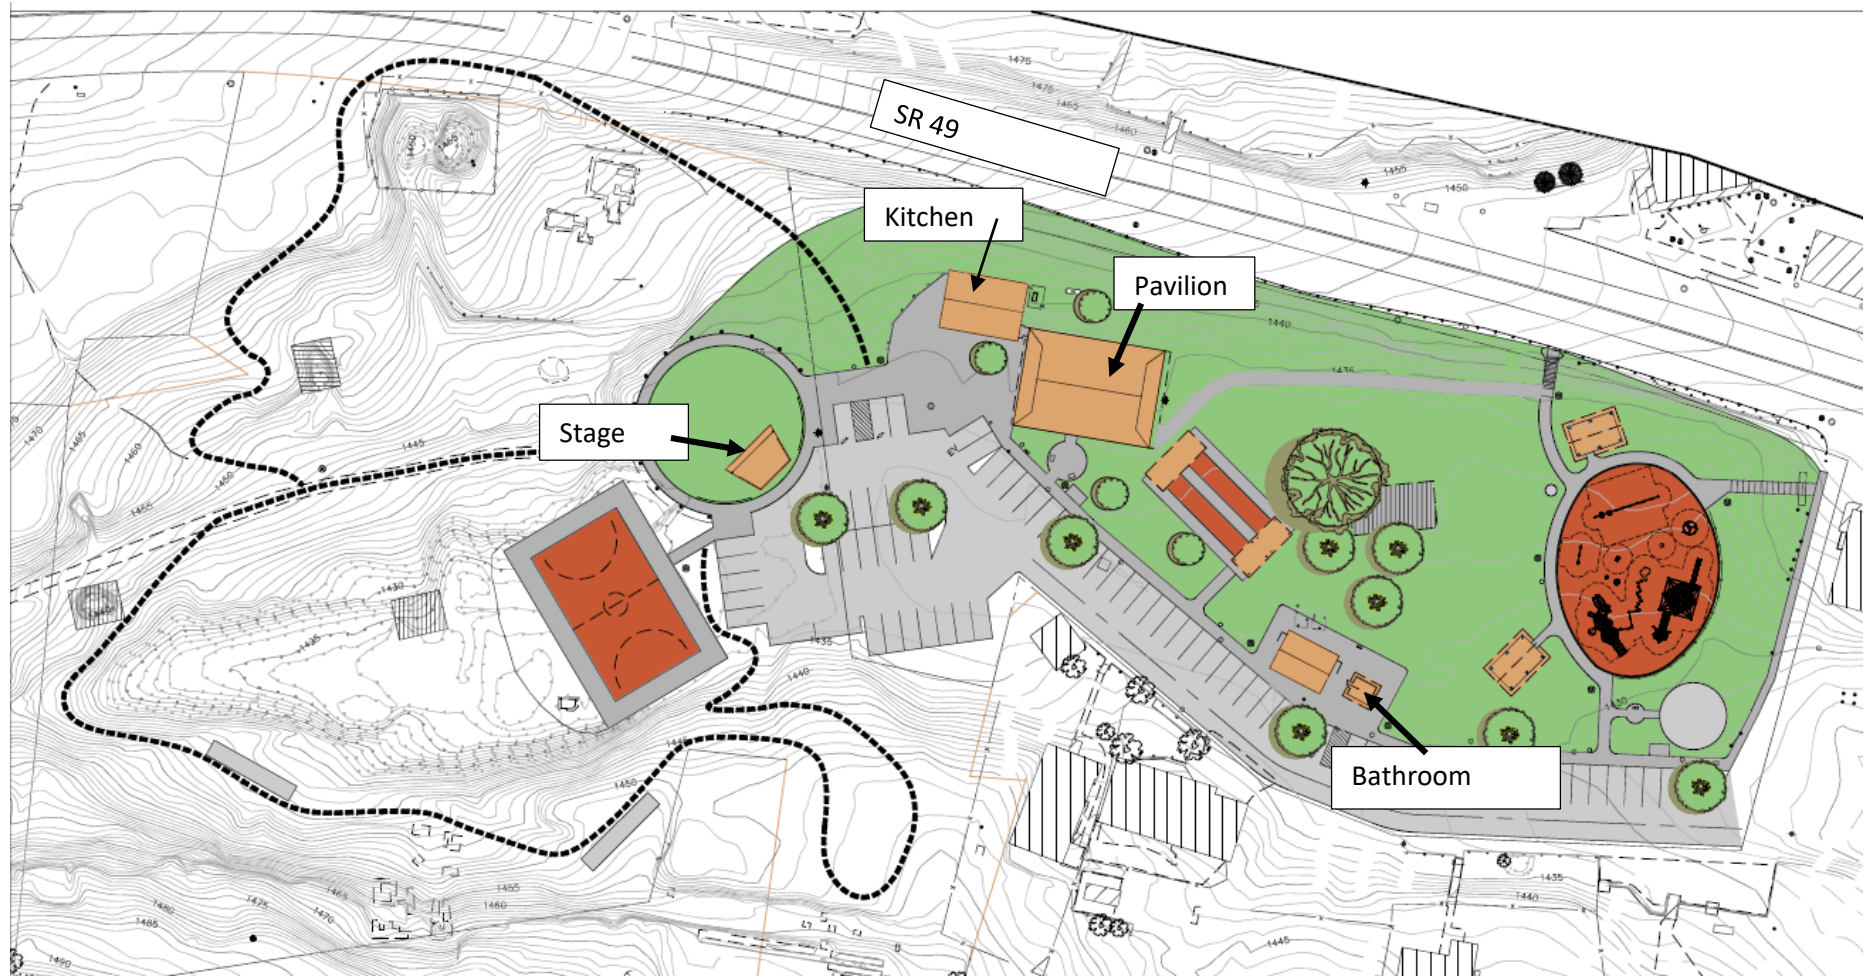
Utica Park New Bathroom (Actual, Constructed)
